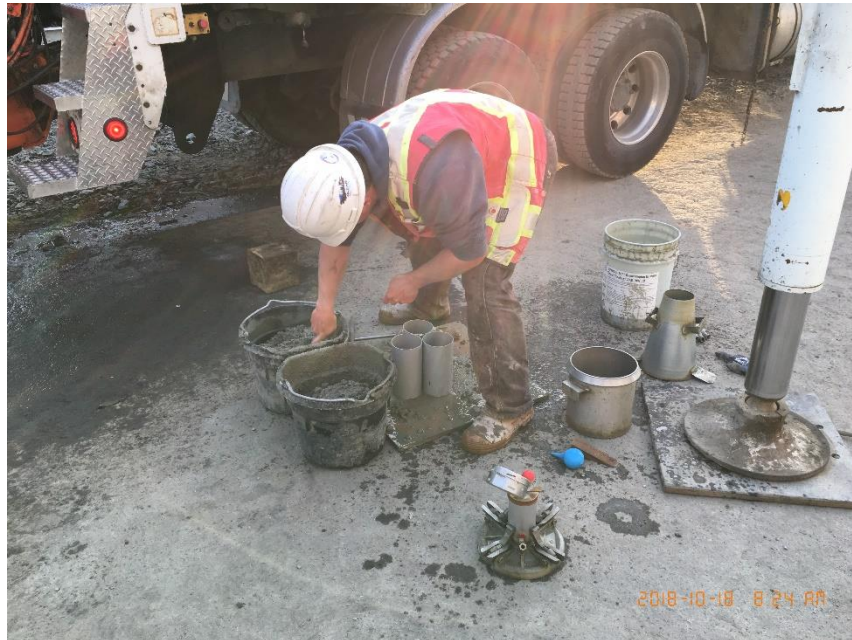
McLoughlin Point Wastewater Treatment Plant: Concrete testing for tertiary wall TB-1-W11 pour.
